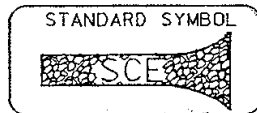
STABILIZED CONSTRUCTION ENTRANCE
